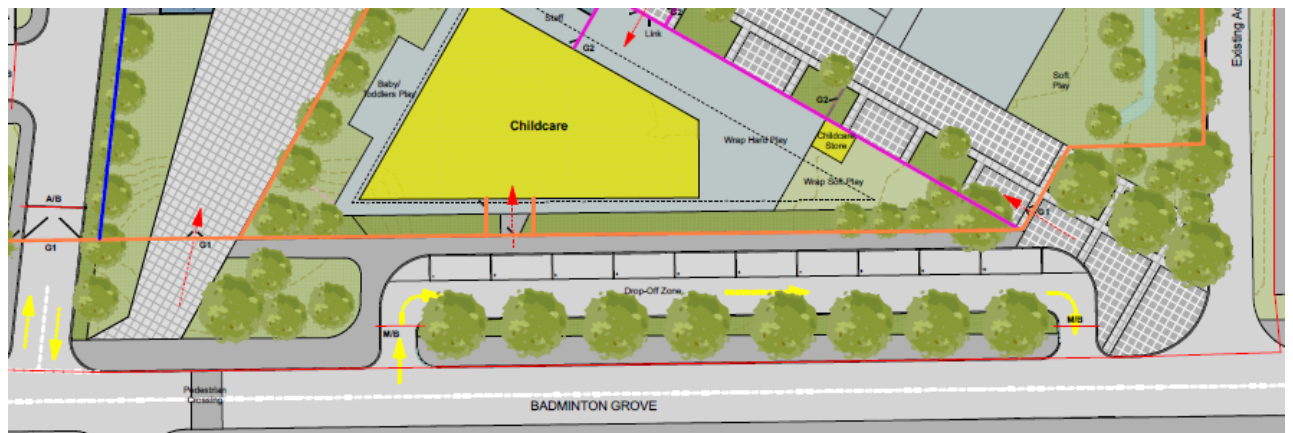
(above) showing proposed drop-off zone to site frontage (Badminton Grove)
